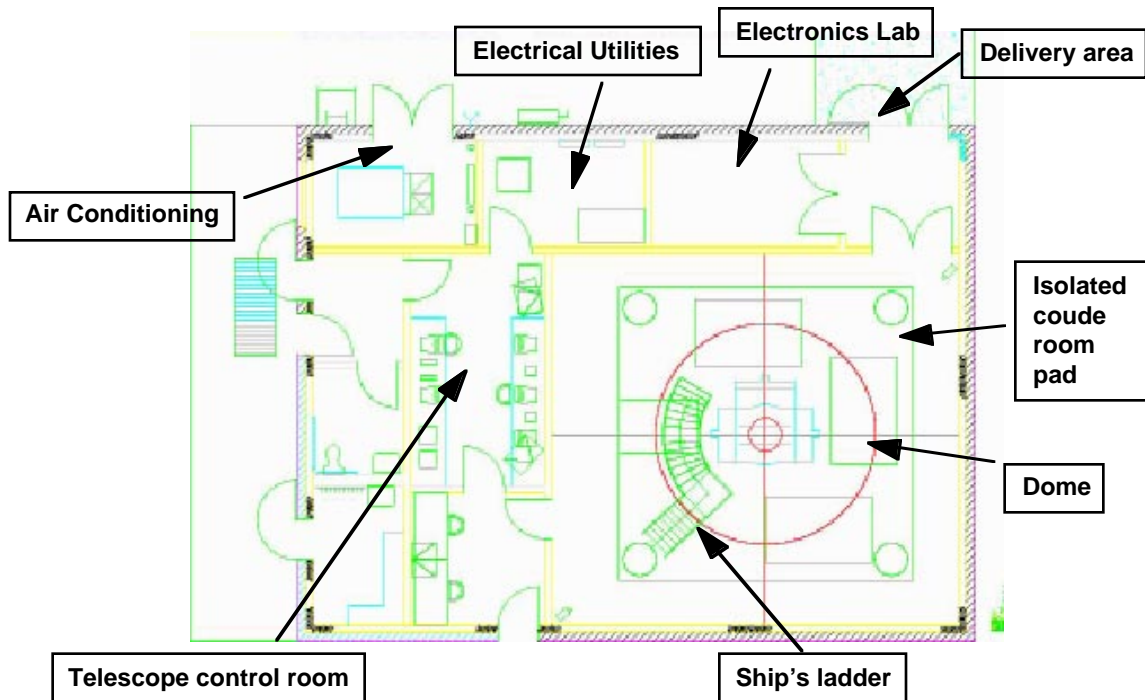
Shows the OCTL building floor plan and the layout of the laser laboratory. The air conditioning and electrical utility rooms are on separate and vibration-isolated concrete slabs from the main building. The outline of the dome and the ship's ladder that provides access from the laser lab to the telescope are also shown in the figure.
